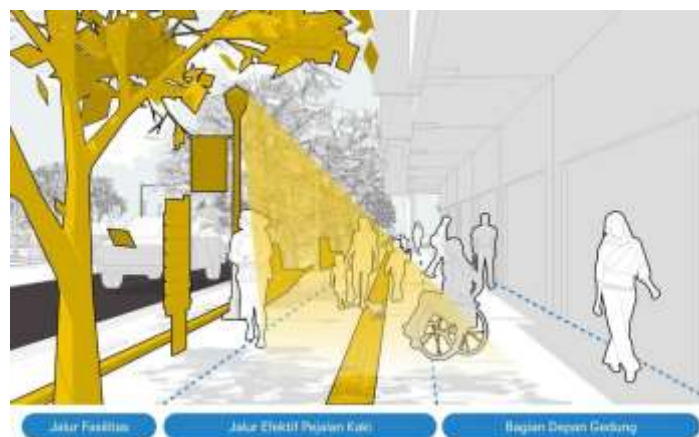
An example of the division of zones on the sidewalk can be seen in
